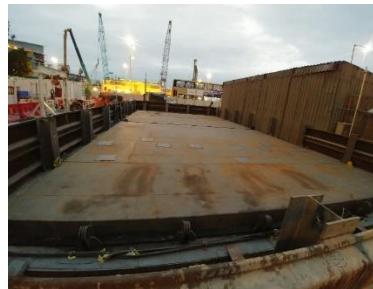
Sample Photos of Noise Cover (Central Kowloon Route – Central Tunnel)
